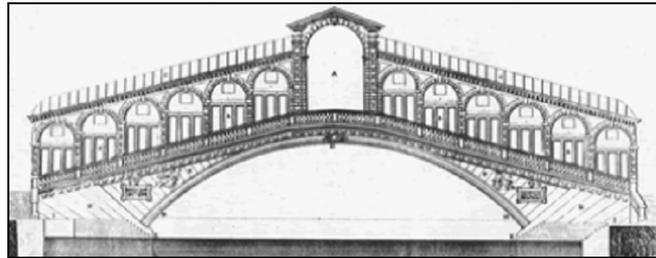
Plan for the Ponte di Rialto, single-arch solution.
